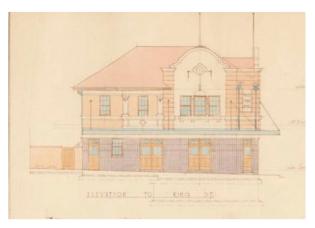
Sidney Warden's architectural drawing for the new White Horse Hotel. Dated June 1929, showing the Princes Highway (King Street) elevation.
